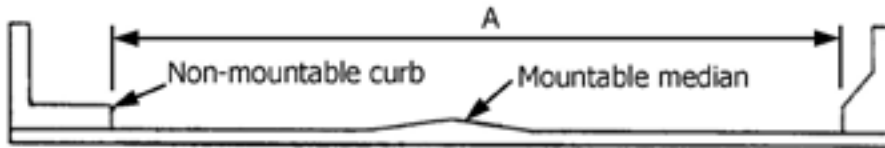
Cross-section view of a highway feature carried on the bridge with a mountable median.
